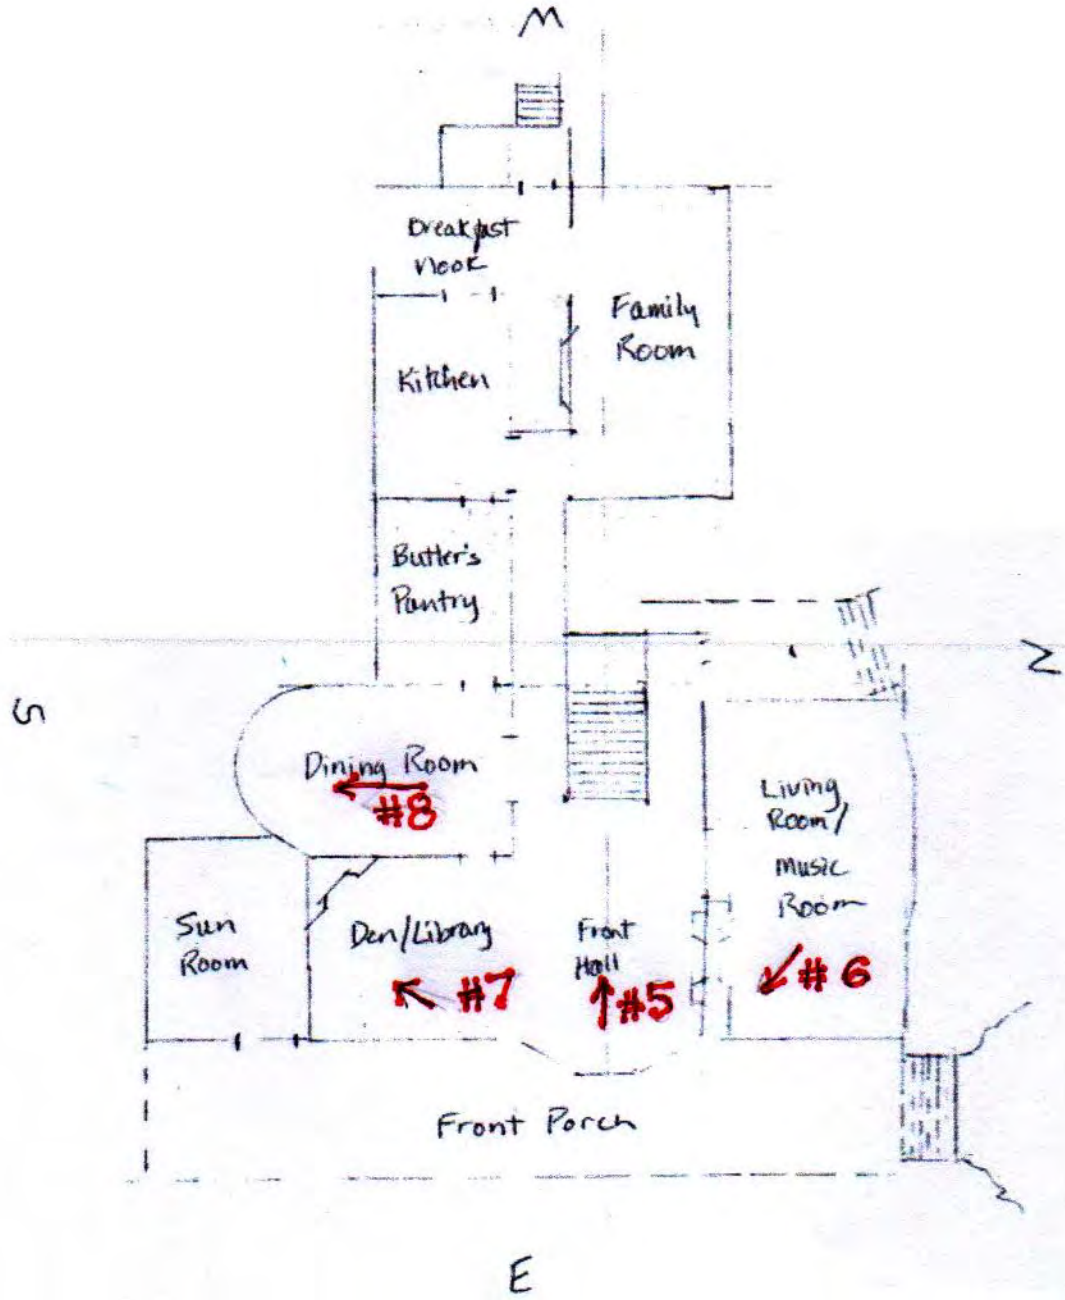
First-Floor Sketch Plan and Photo Key (in red) of the H.R. Reed House. Present plan drawn by Judith Rosbe.
